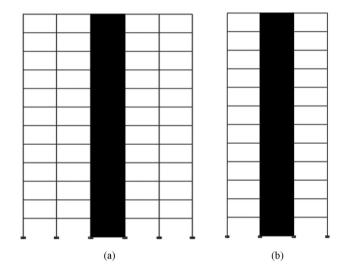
Elevation of the considered buildings. a Longitudinal direction and b transverse direction
